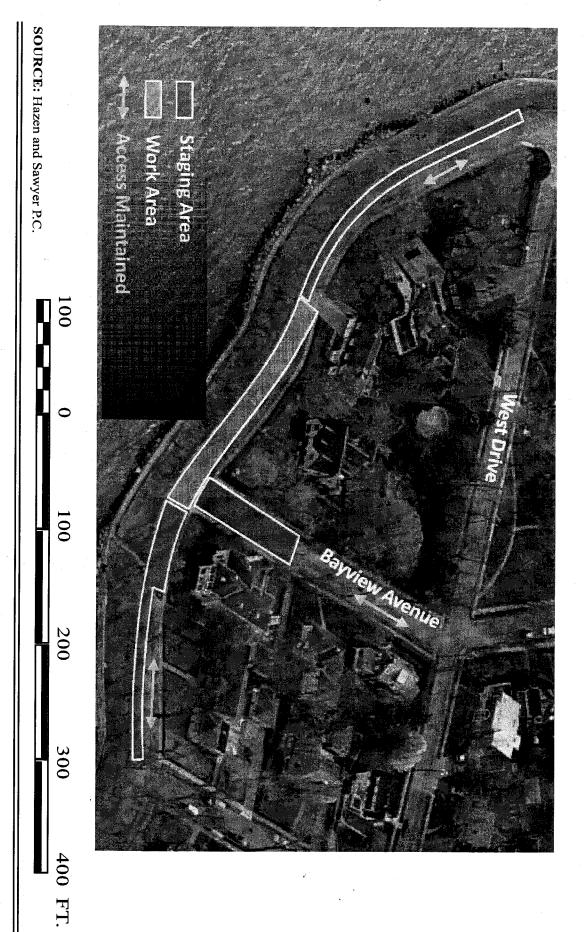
Current Aerial Photo, Collapse 1: Bayview Avenue
